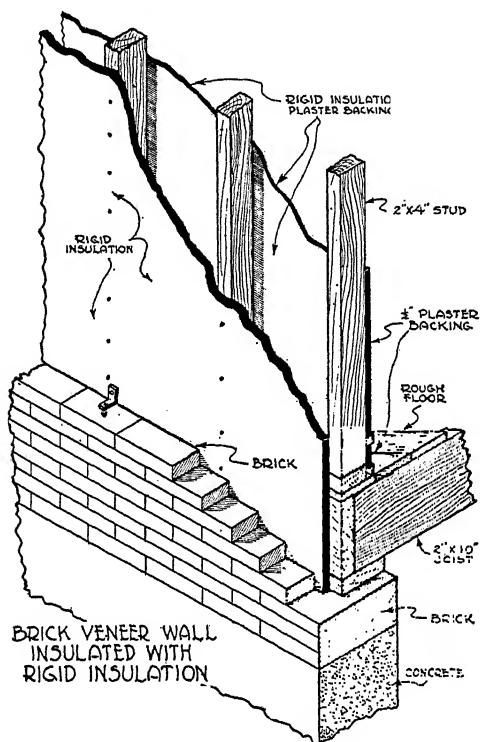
Typical Brick Veneer Wall with Rigid Insulation
